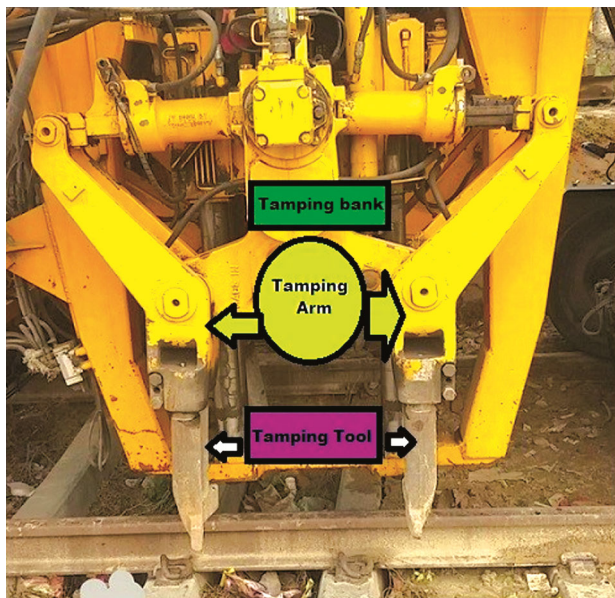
Actual view of tamping unit of a multi-purpose track tamping machine.
